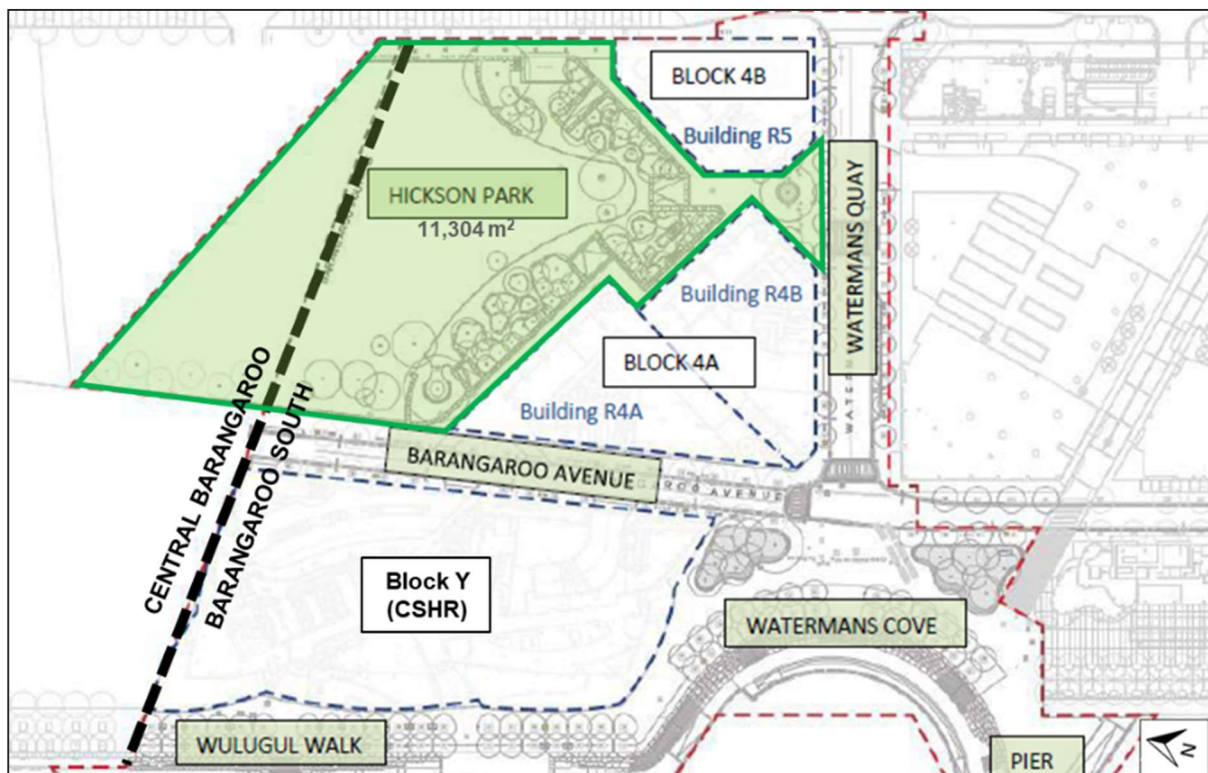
| Public domain works overview (showing completed Hickson Park / Barton Street removed) and Barangaroo South / Central Barangaroo boundary shown as black-dashed line (Base source: SSD 7944)
